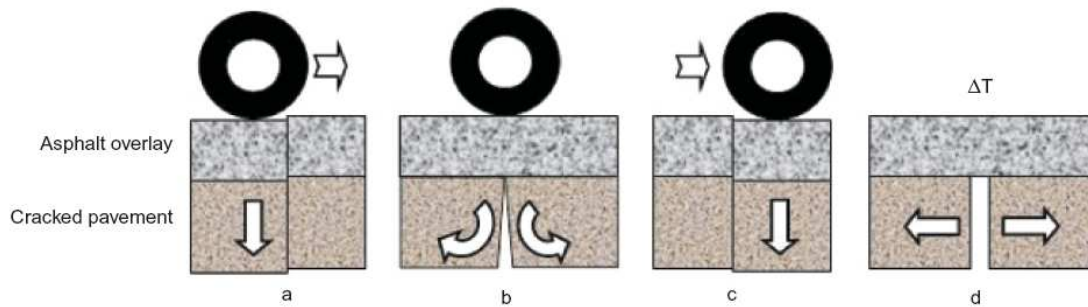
Movements in pavement joints and cracks (Francken et al., 1997)
